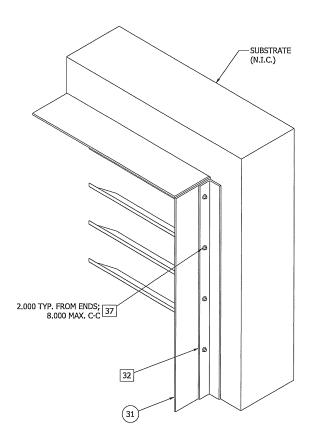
DETAIL H UNIVERSAL SLEEVE WELDMENT/CONNECTION DETAIL JAMBS
